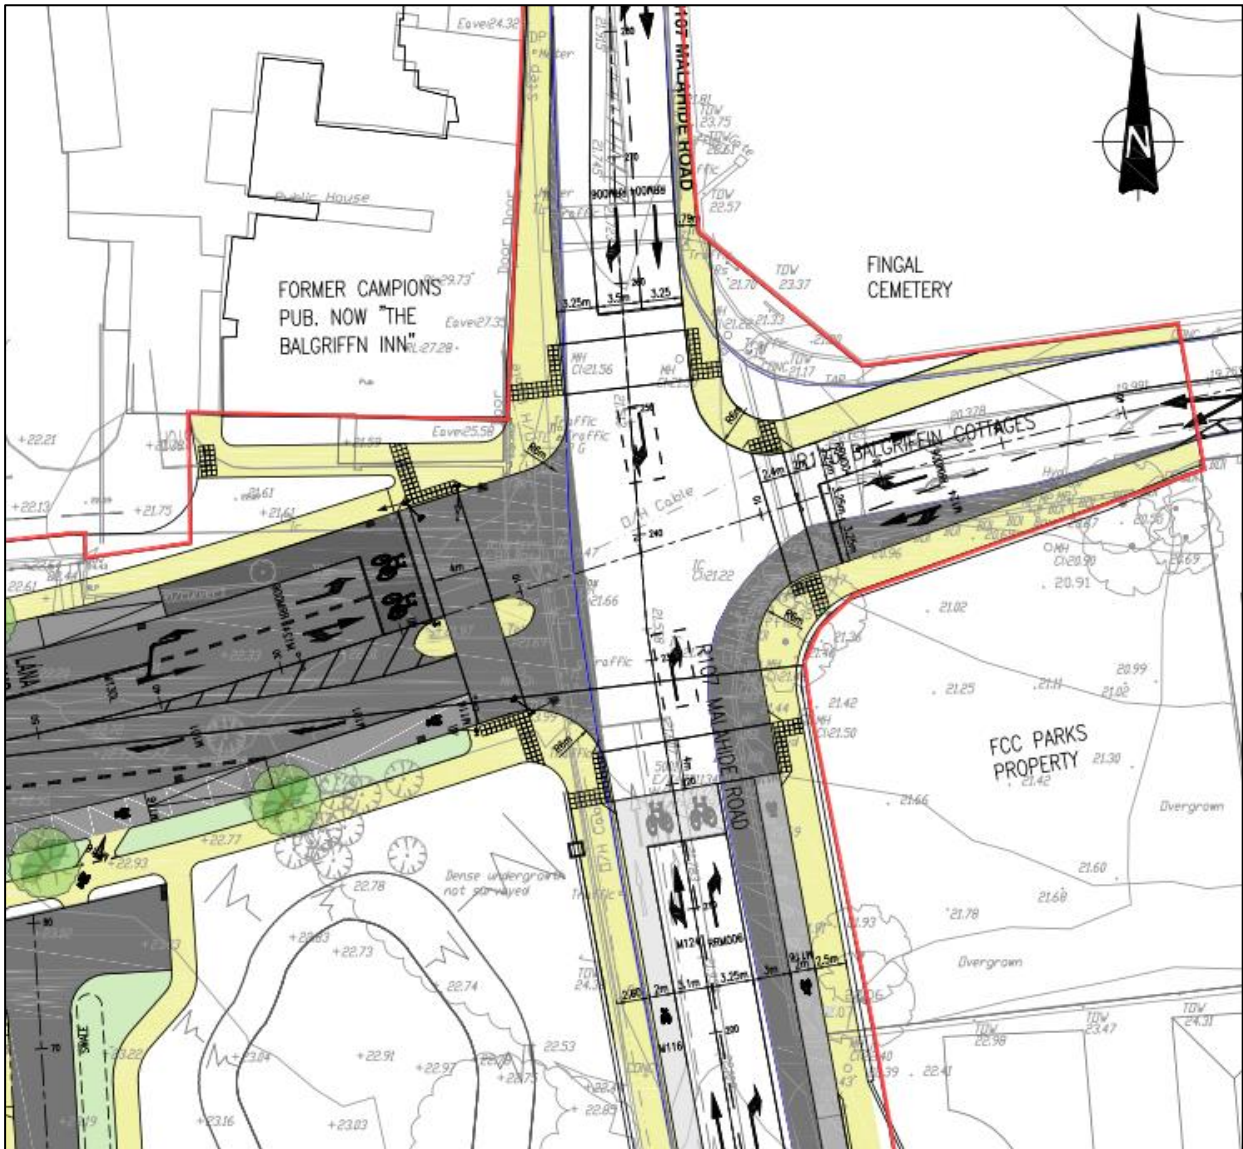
| Malahide Road (R107) / Balgriffin Road – New Layout (Phase 1B Application).
